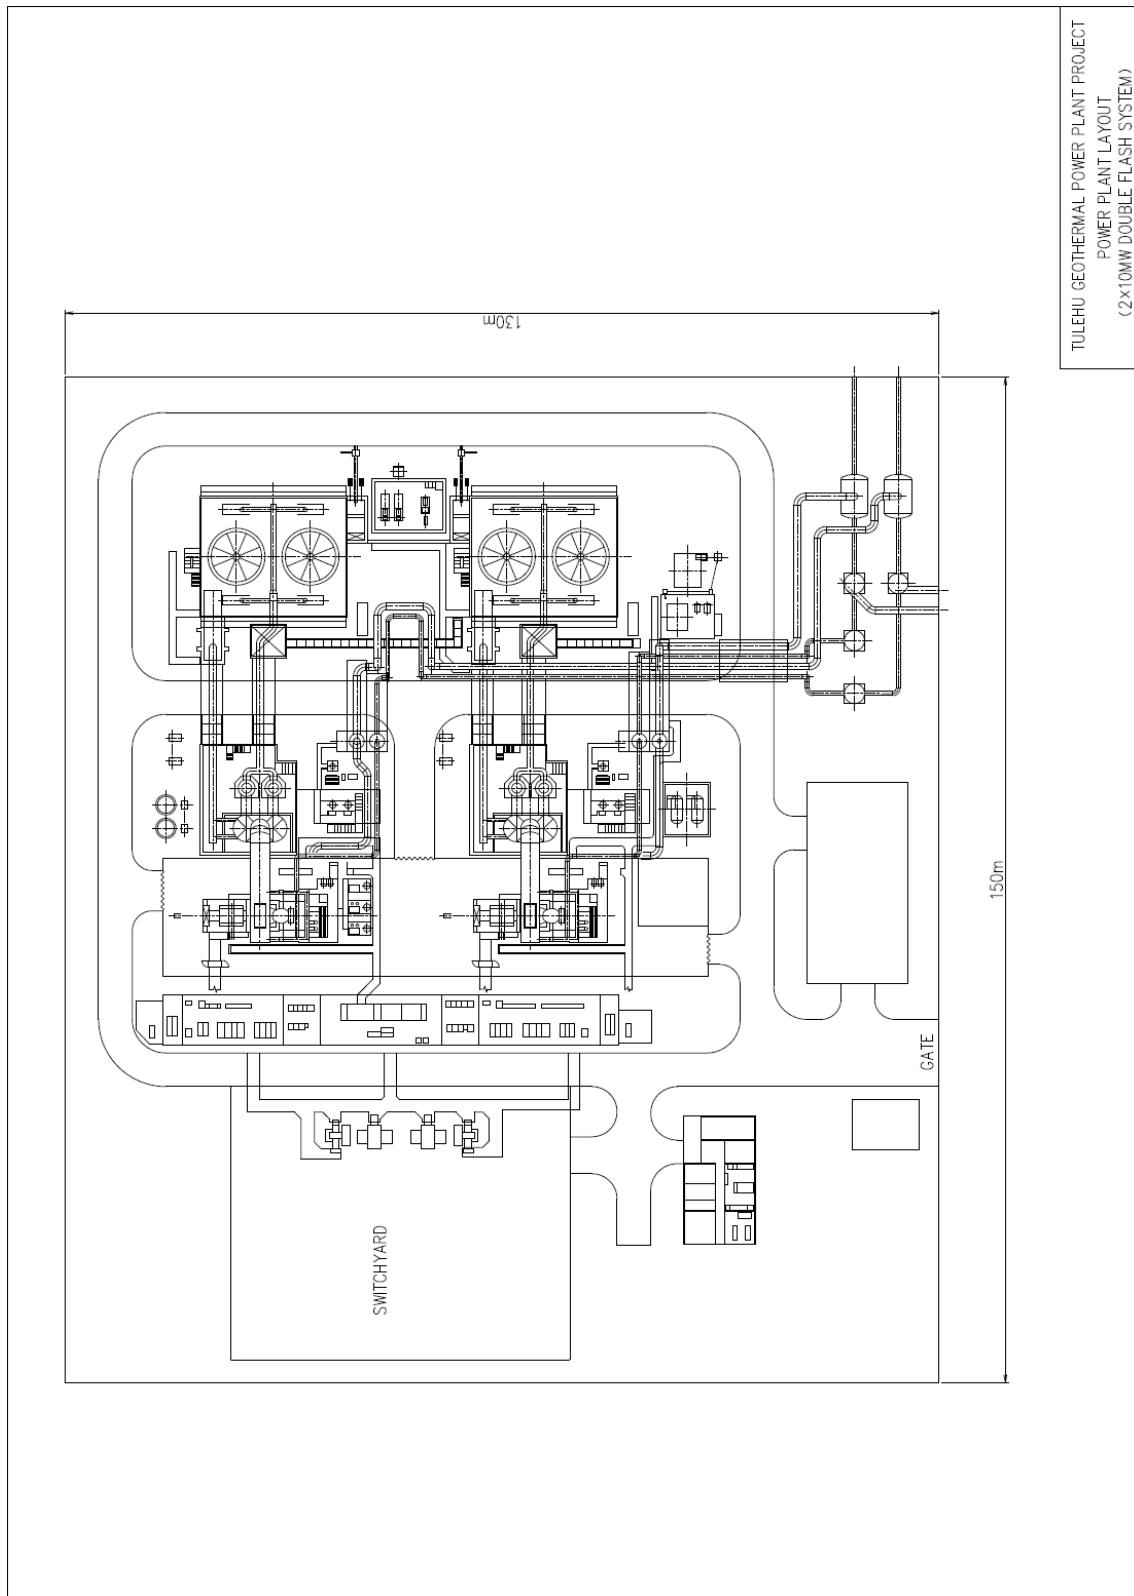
Power Plant Layout (2 x 10 MW Double Flash System)
